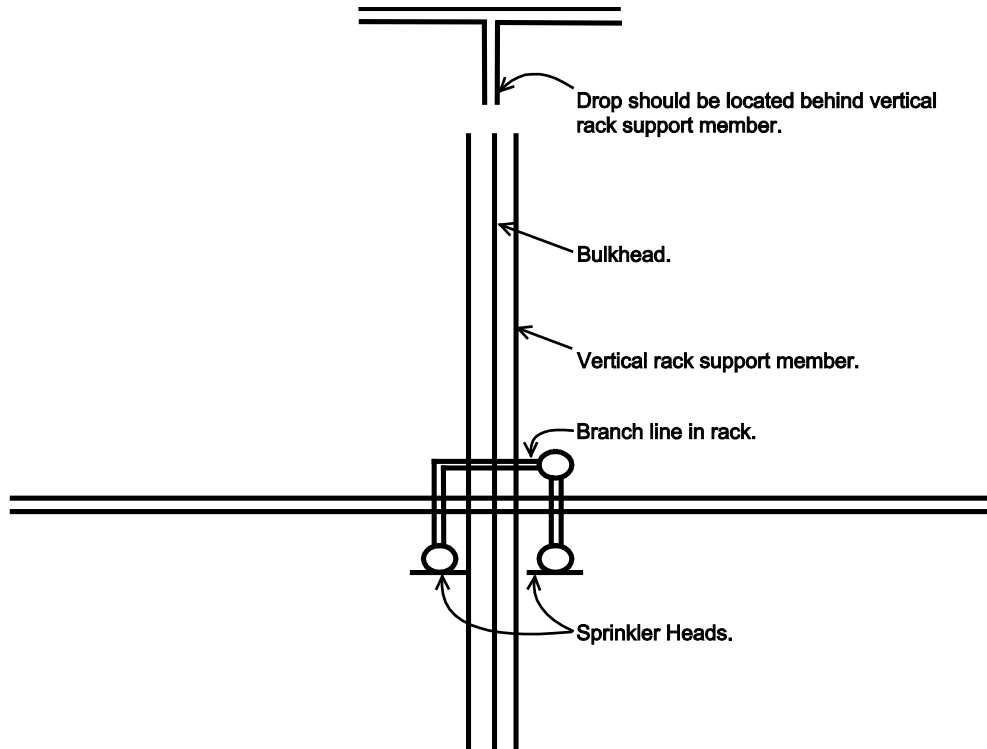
Rack Sprinkler Installation With Fire Stops or Bulkheads.
